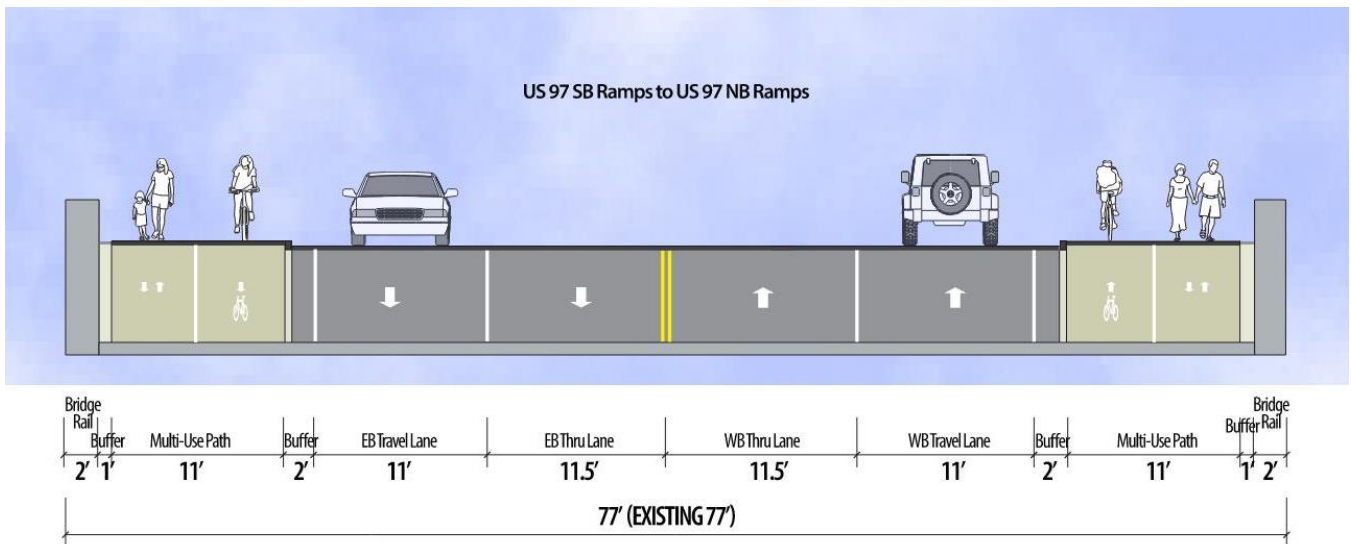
POTENTIAL LONG-TERM REED MARKET ROAD CROSS SECTION (US 97 SOUTHBOUND RAMPS TO US 97 NORTHBOUND RAMPS)
